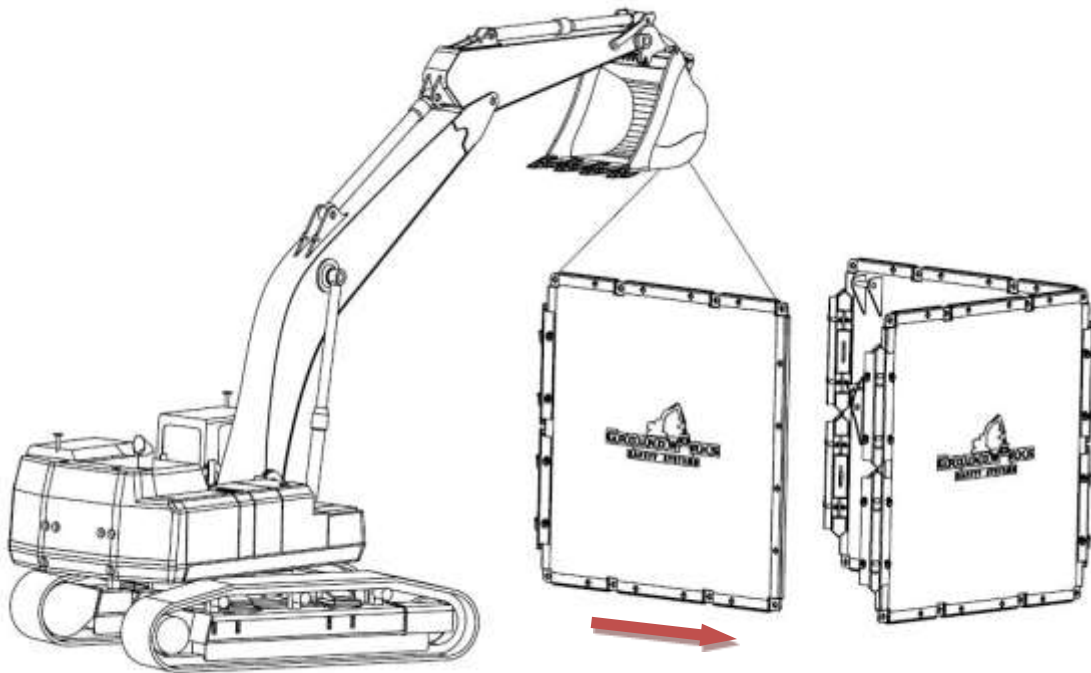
Pit Kit Step Six – Assembling Third Panel with Panels One and Two
